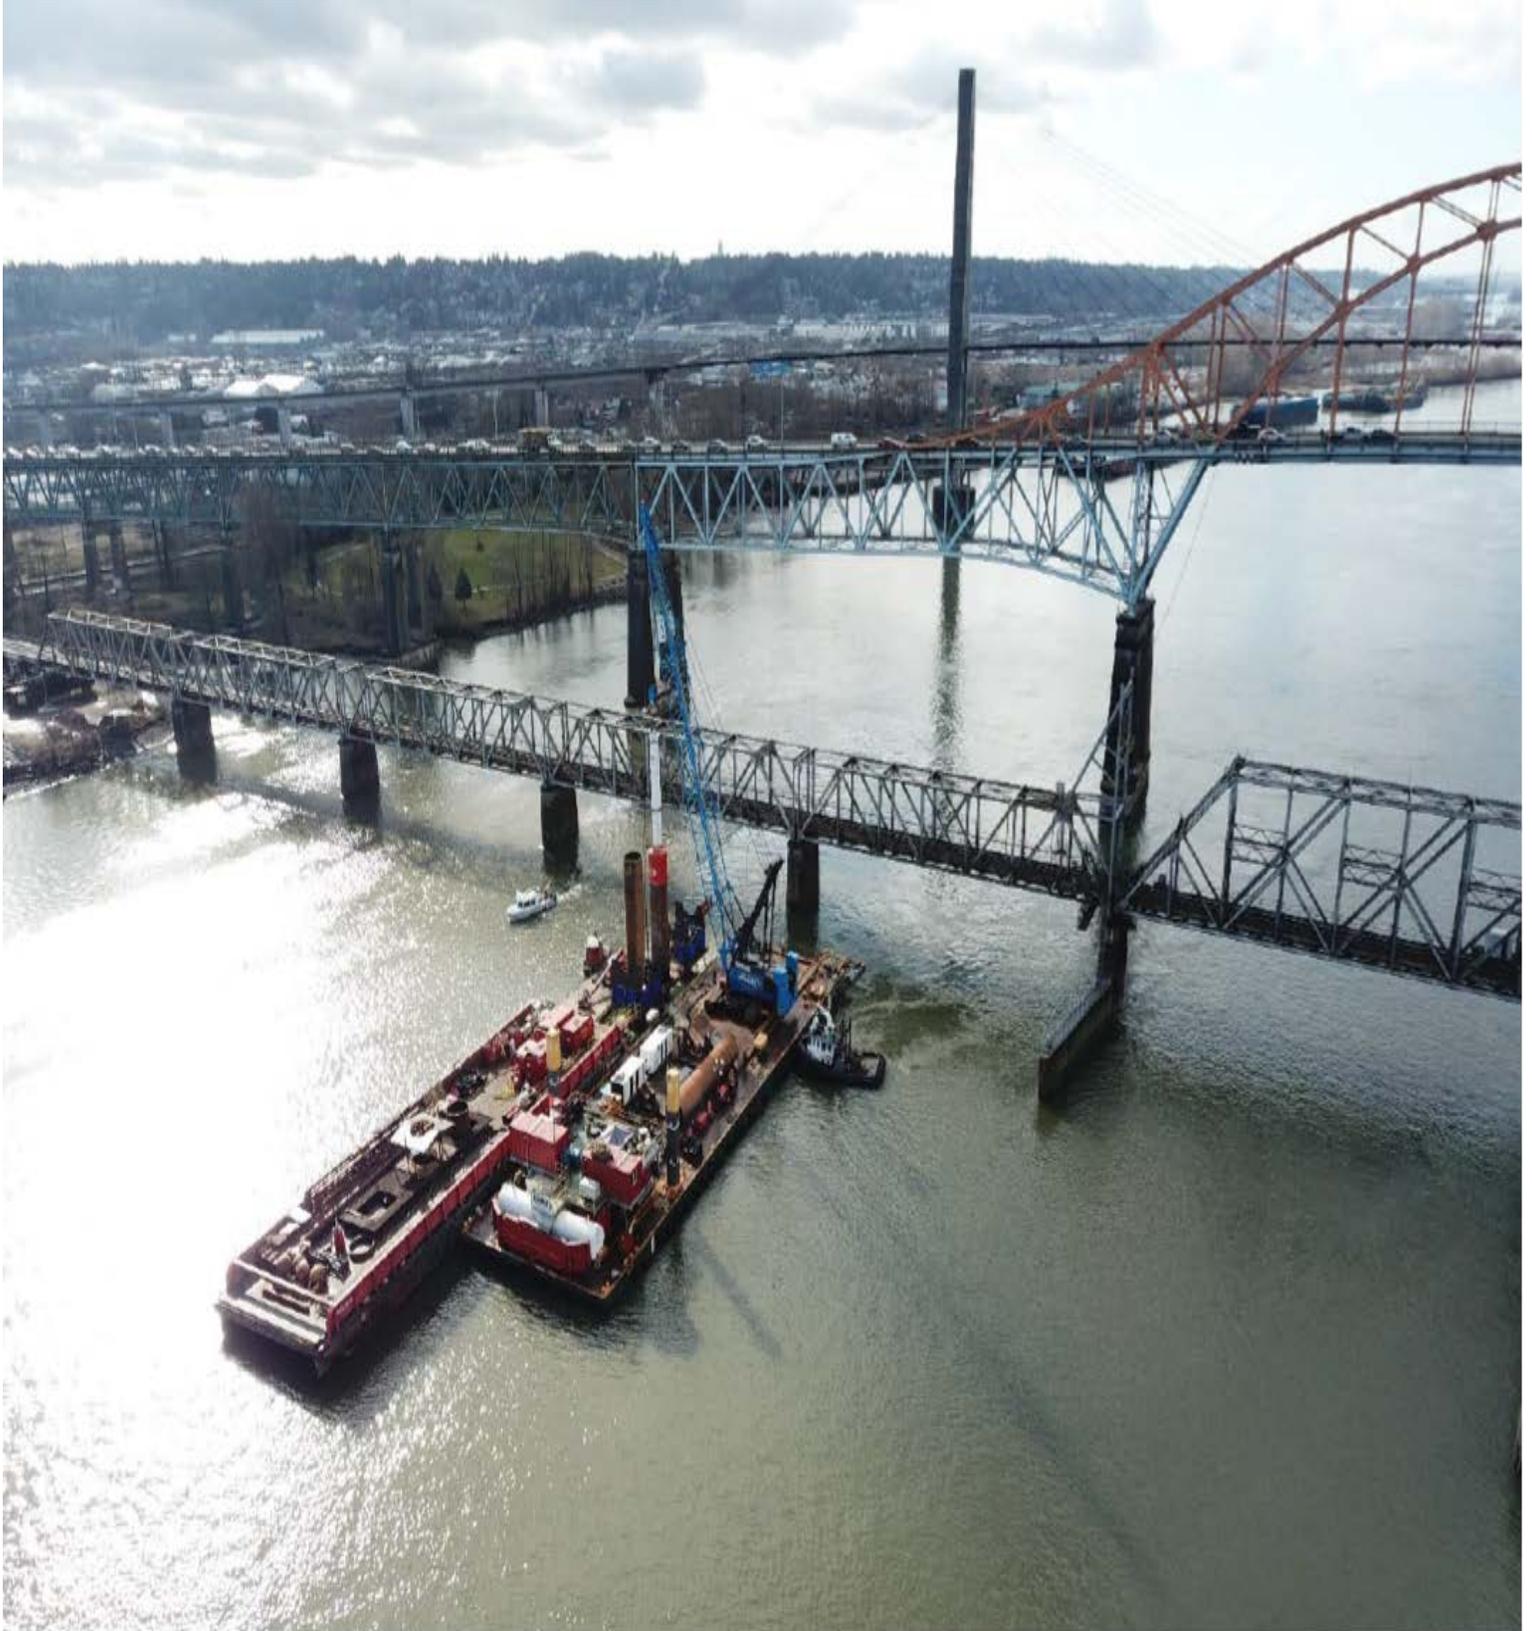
AERIAL VIEW OF S1 PILING WORKS
